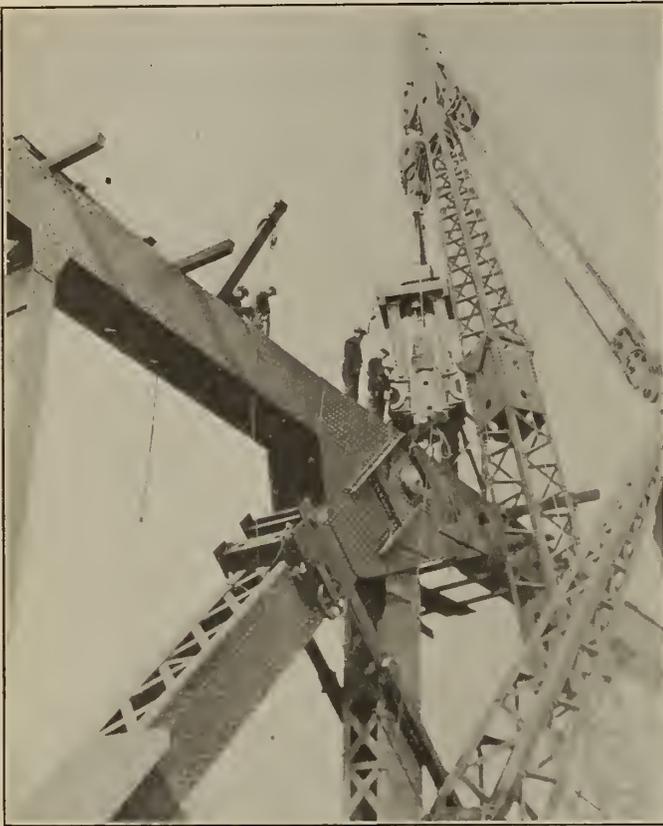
Main Span, Centre Section—Detail at *CU0* showing Erection Wedge Mechanism being Placed.
